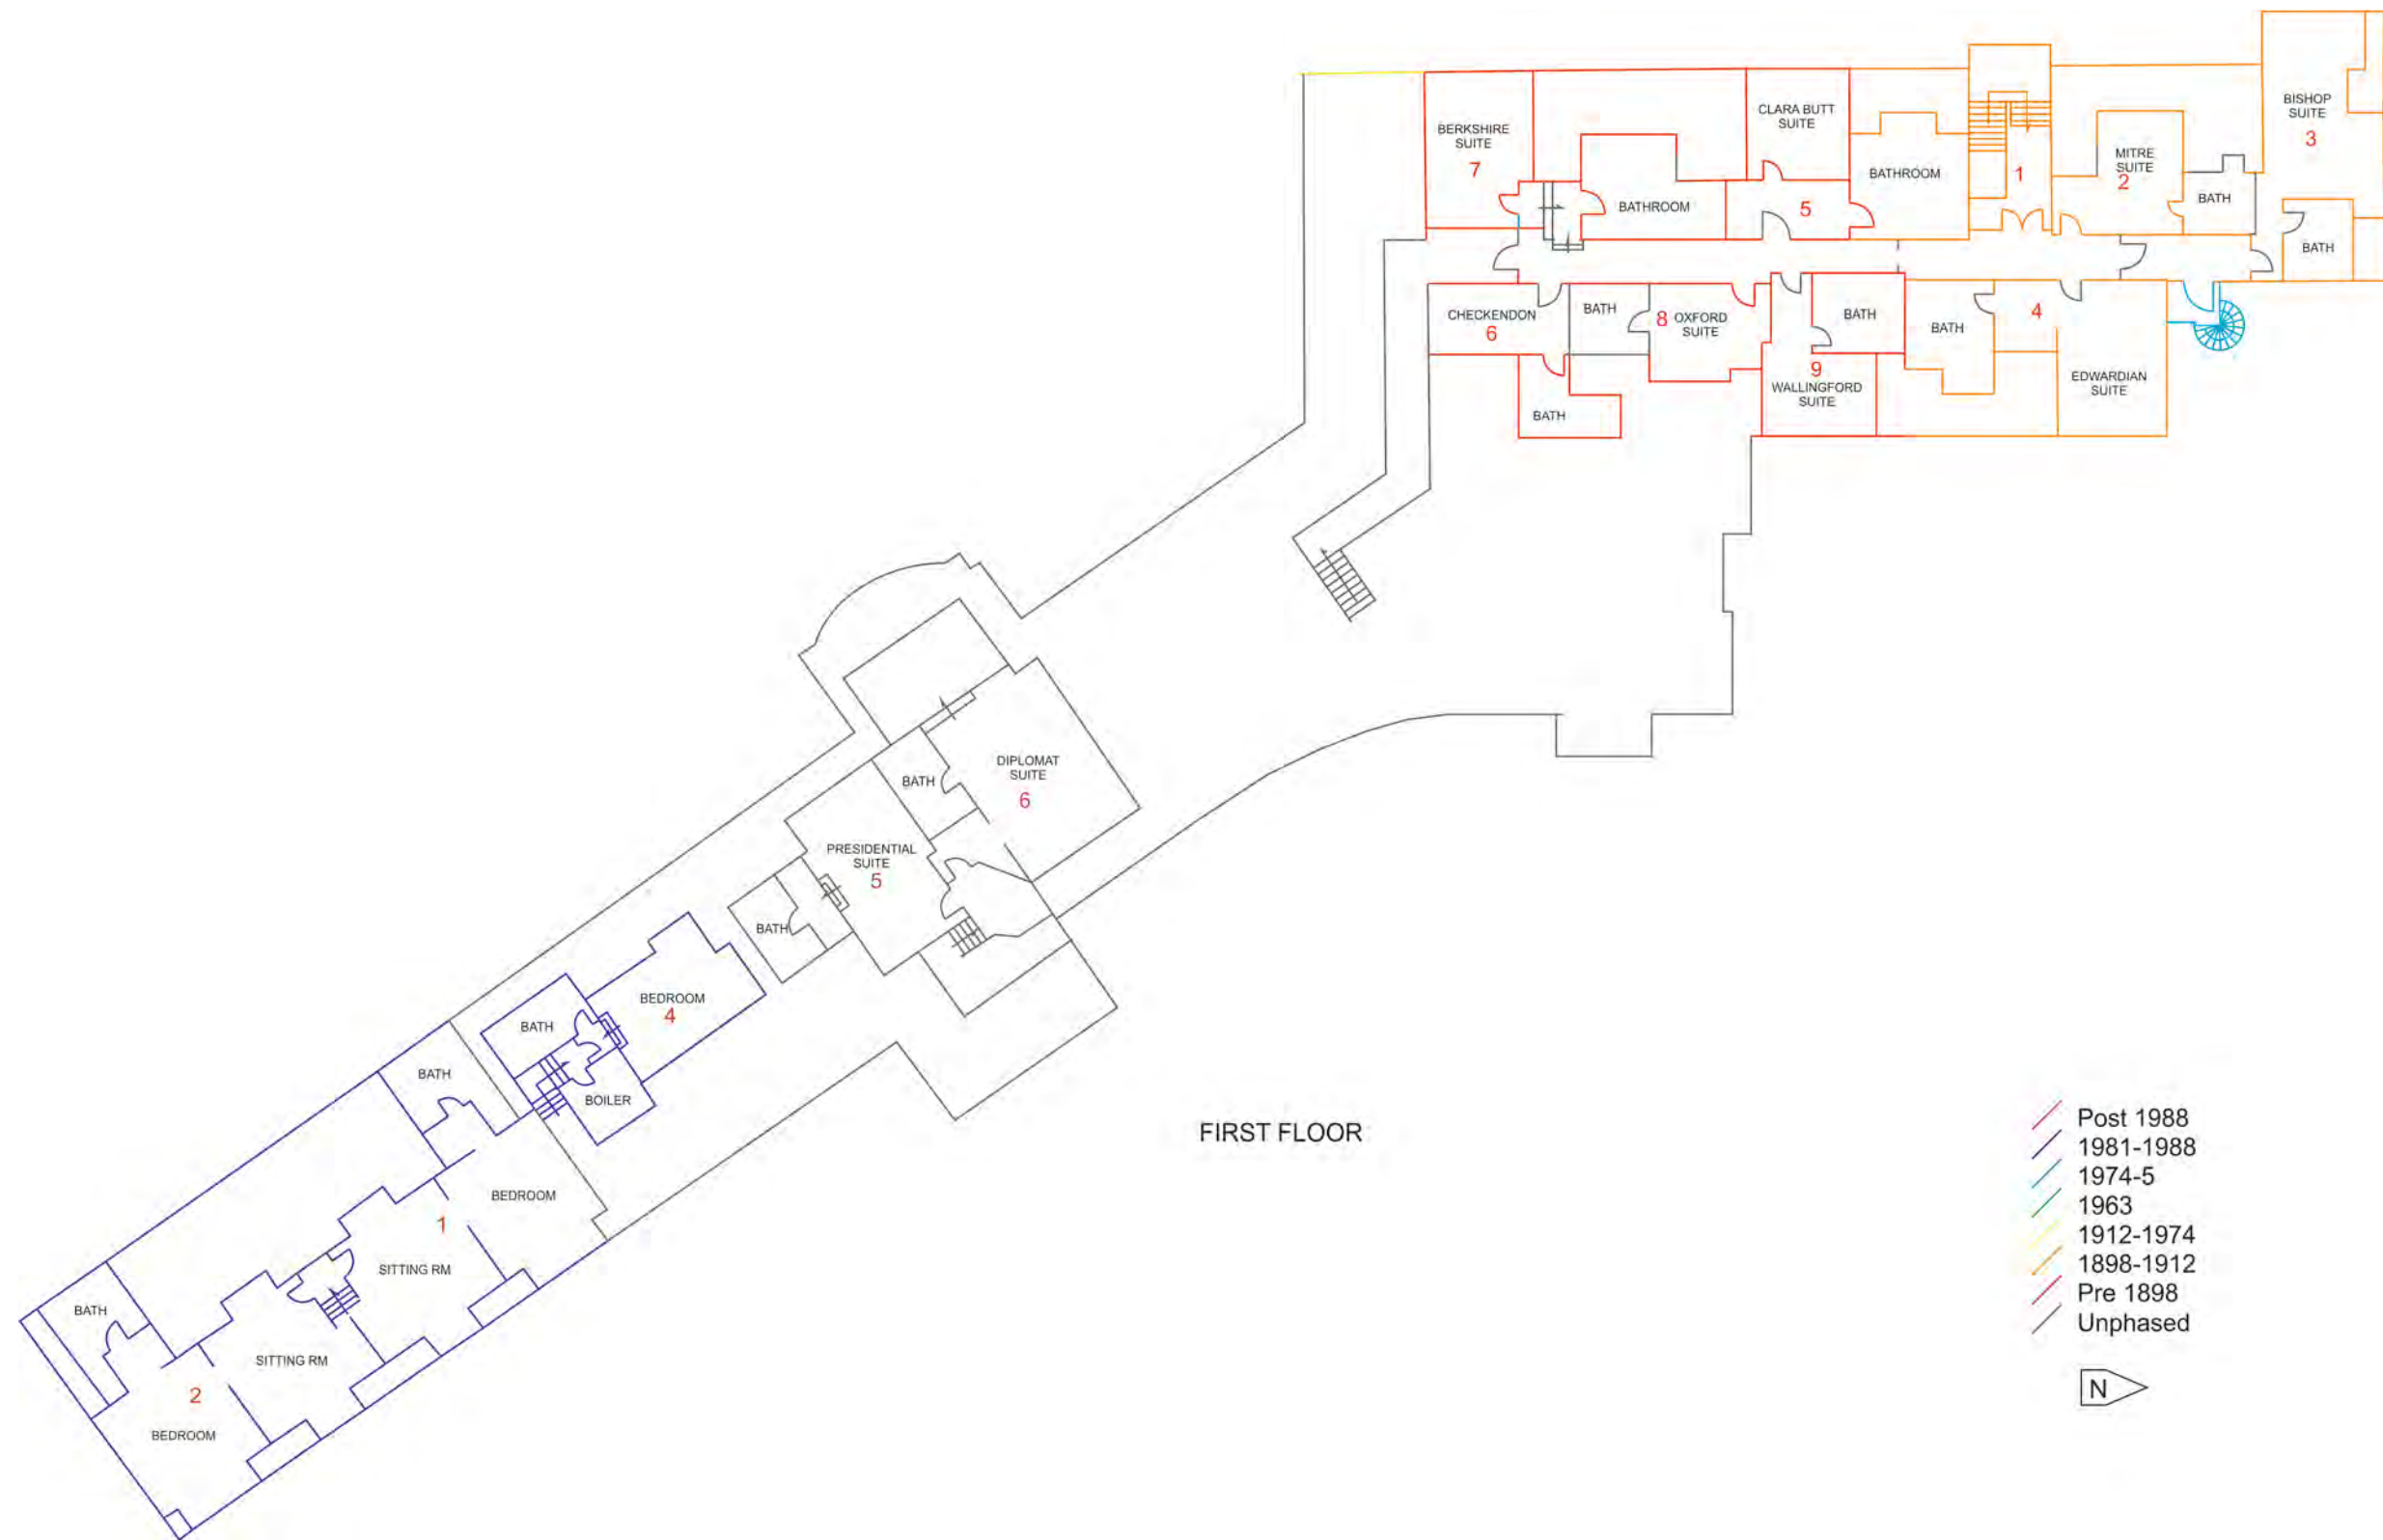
Phase Plan: First Floor, 1:250 @ A3
